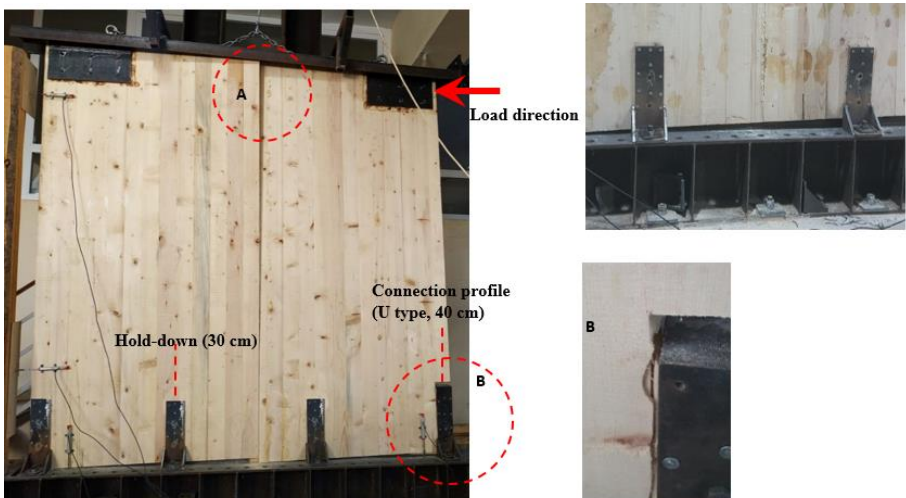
CLT wall to foundation Detail-5 and deformation of connections
